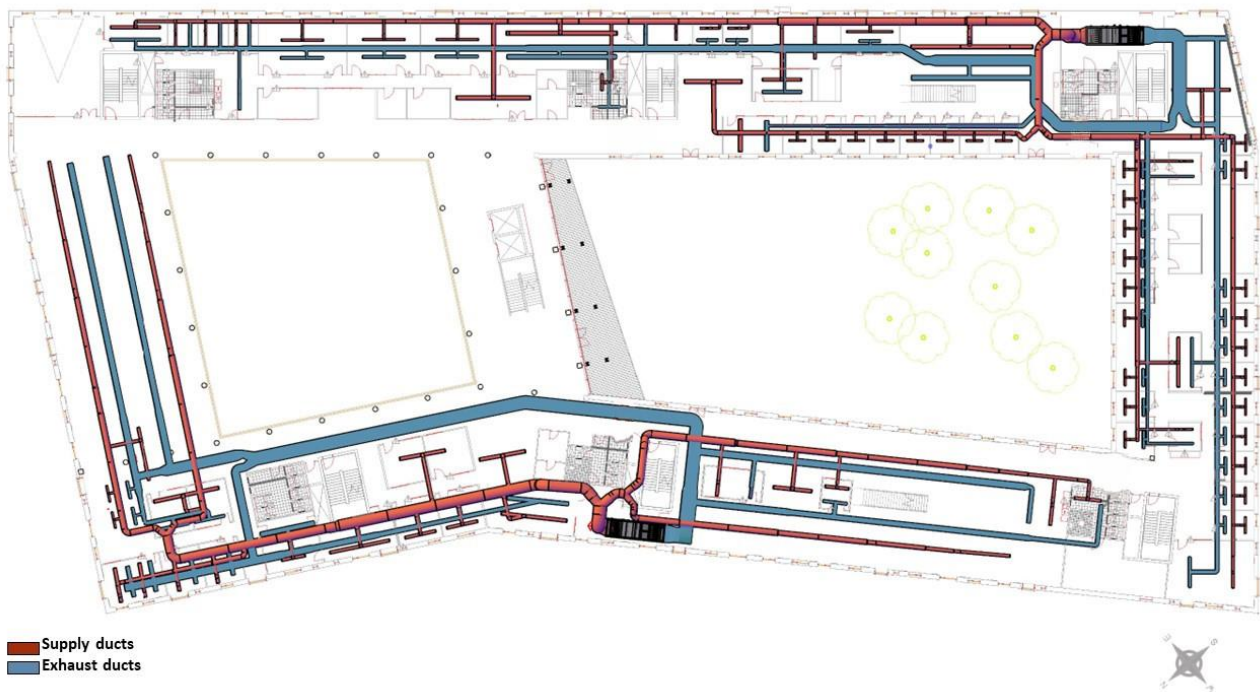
Ventilation layout for City Campus Aalborg building applying Prihoda tailor made fabric ductwork.
